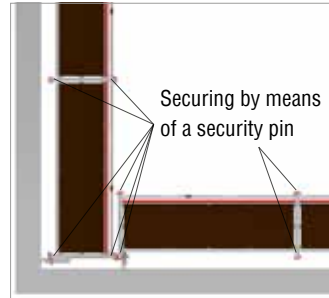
Example of the tension-proof connection of the scaffold levels for lifting wind forces for inside corners
